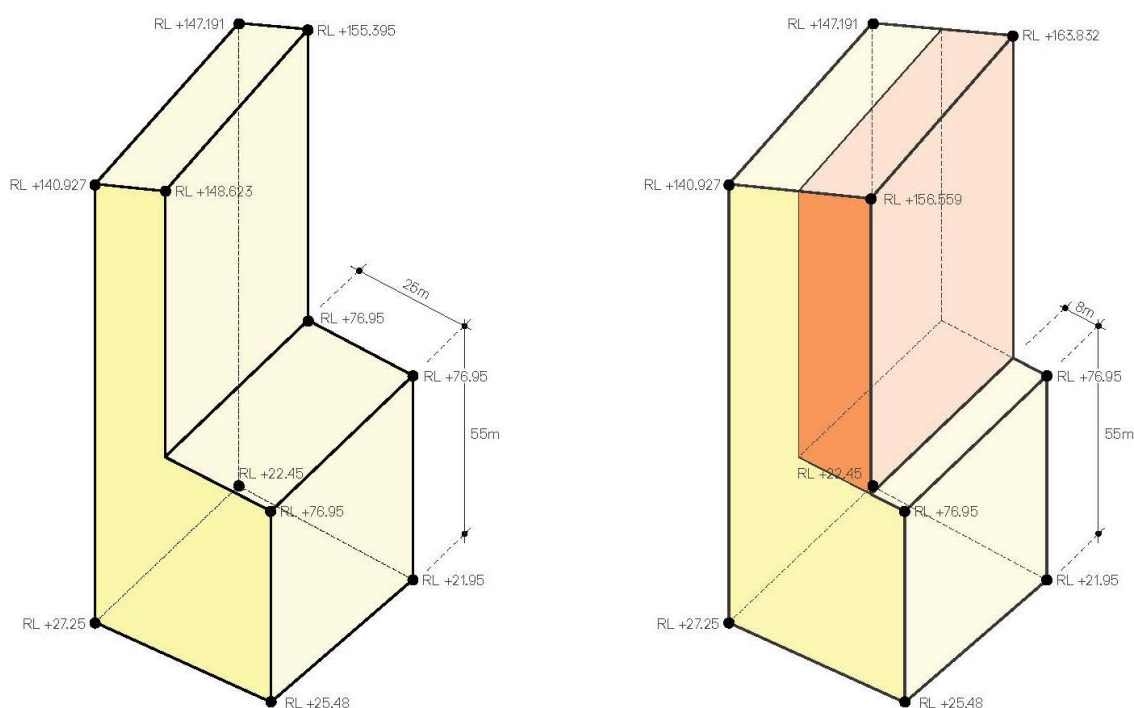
North Site and South Site Approved OSD Building Envelopes
